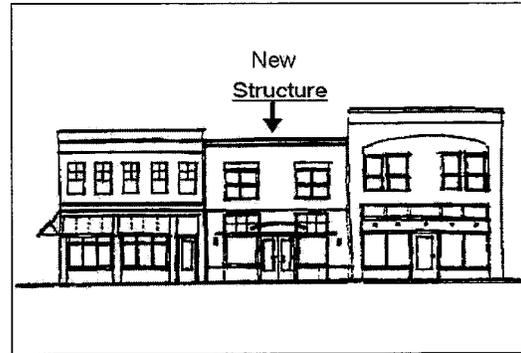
Second story floors of new structure visually align with those of adjacent existing structures creating a consistent appearance for the street.
